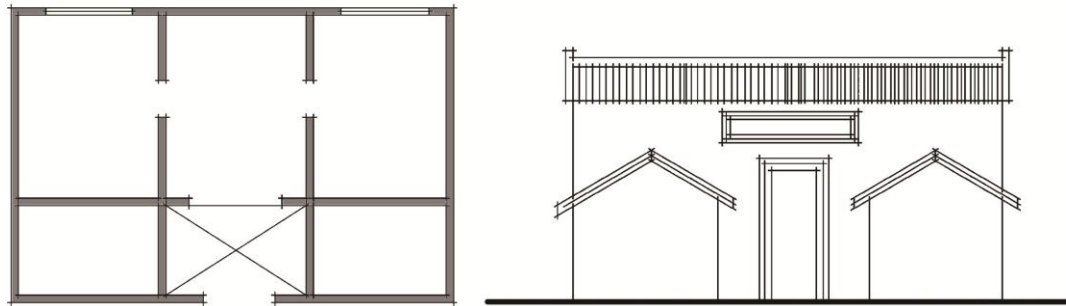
A sample of floor plan and façade of a *sanjian lianglang* house
